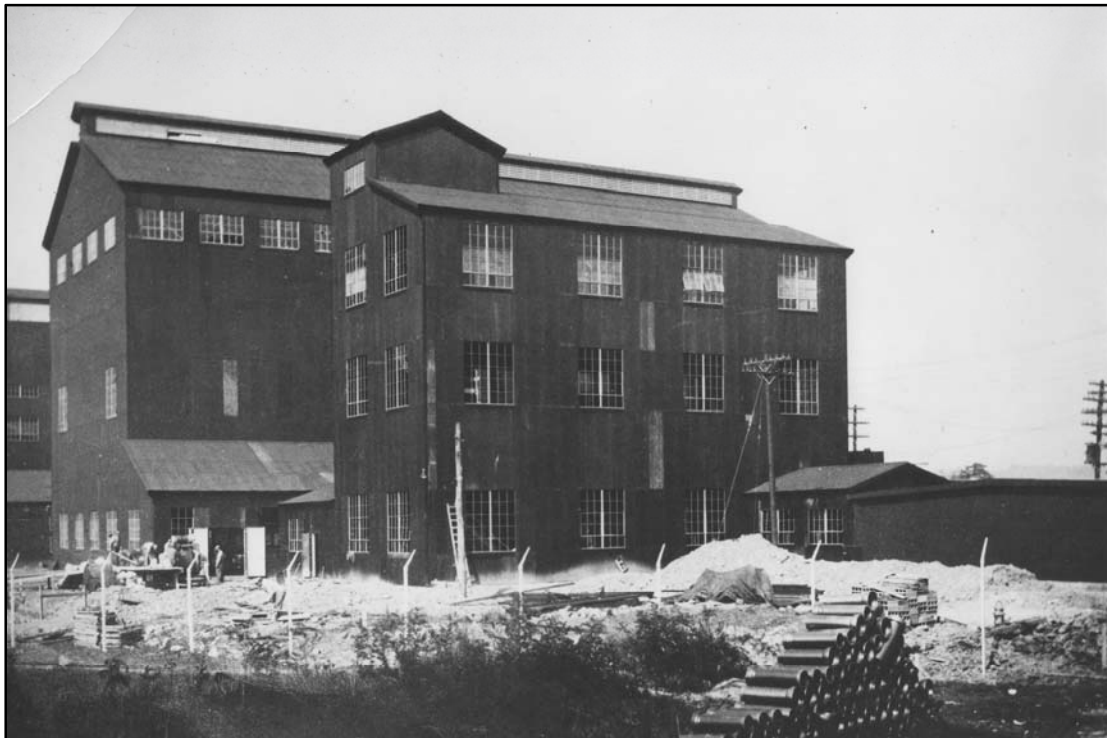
Acid plant (left) and roaster plant (right) under construction, September 18, 1930.<sup>18</sup>
